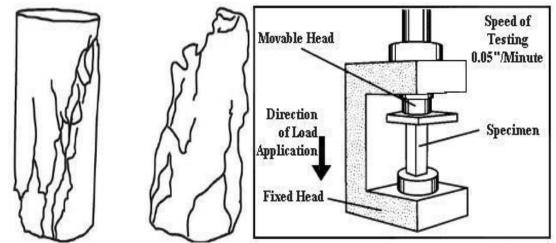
Typical Compressive Strength Test on Hardened Concrete Cores
